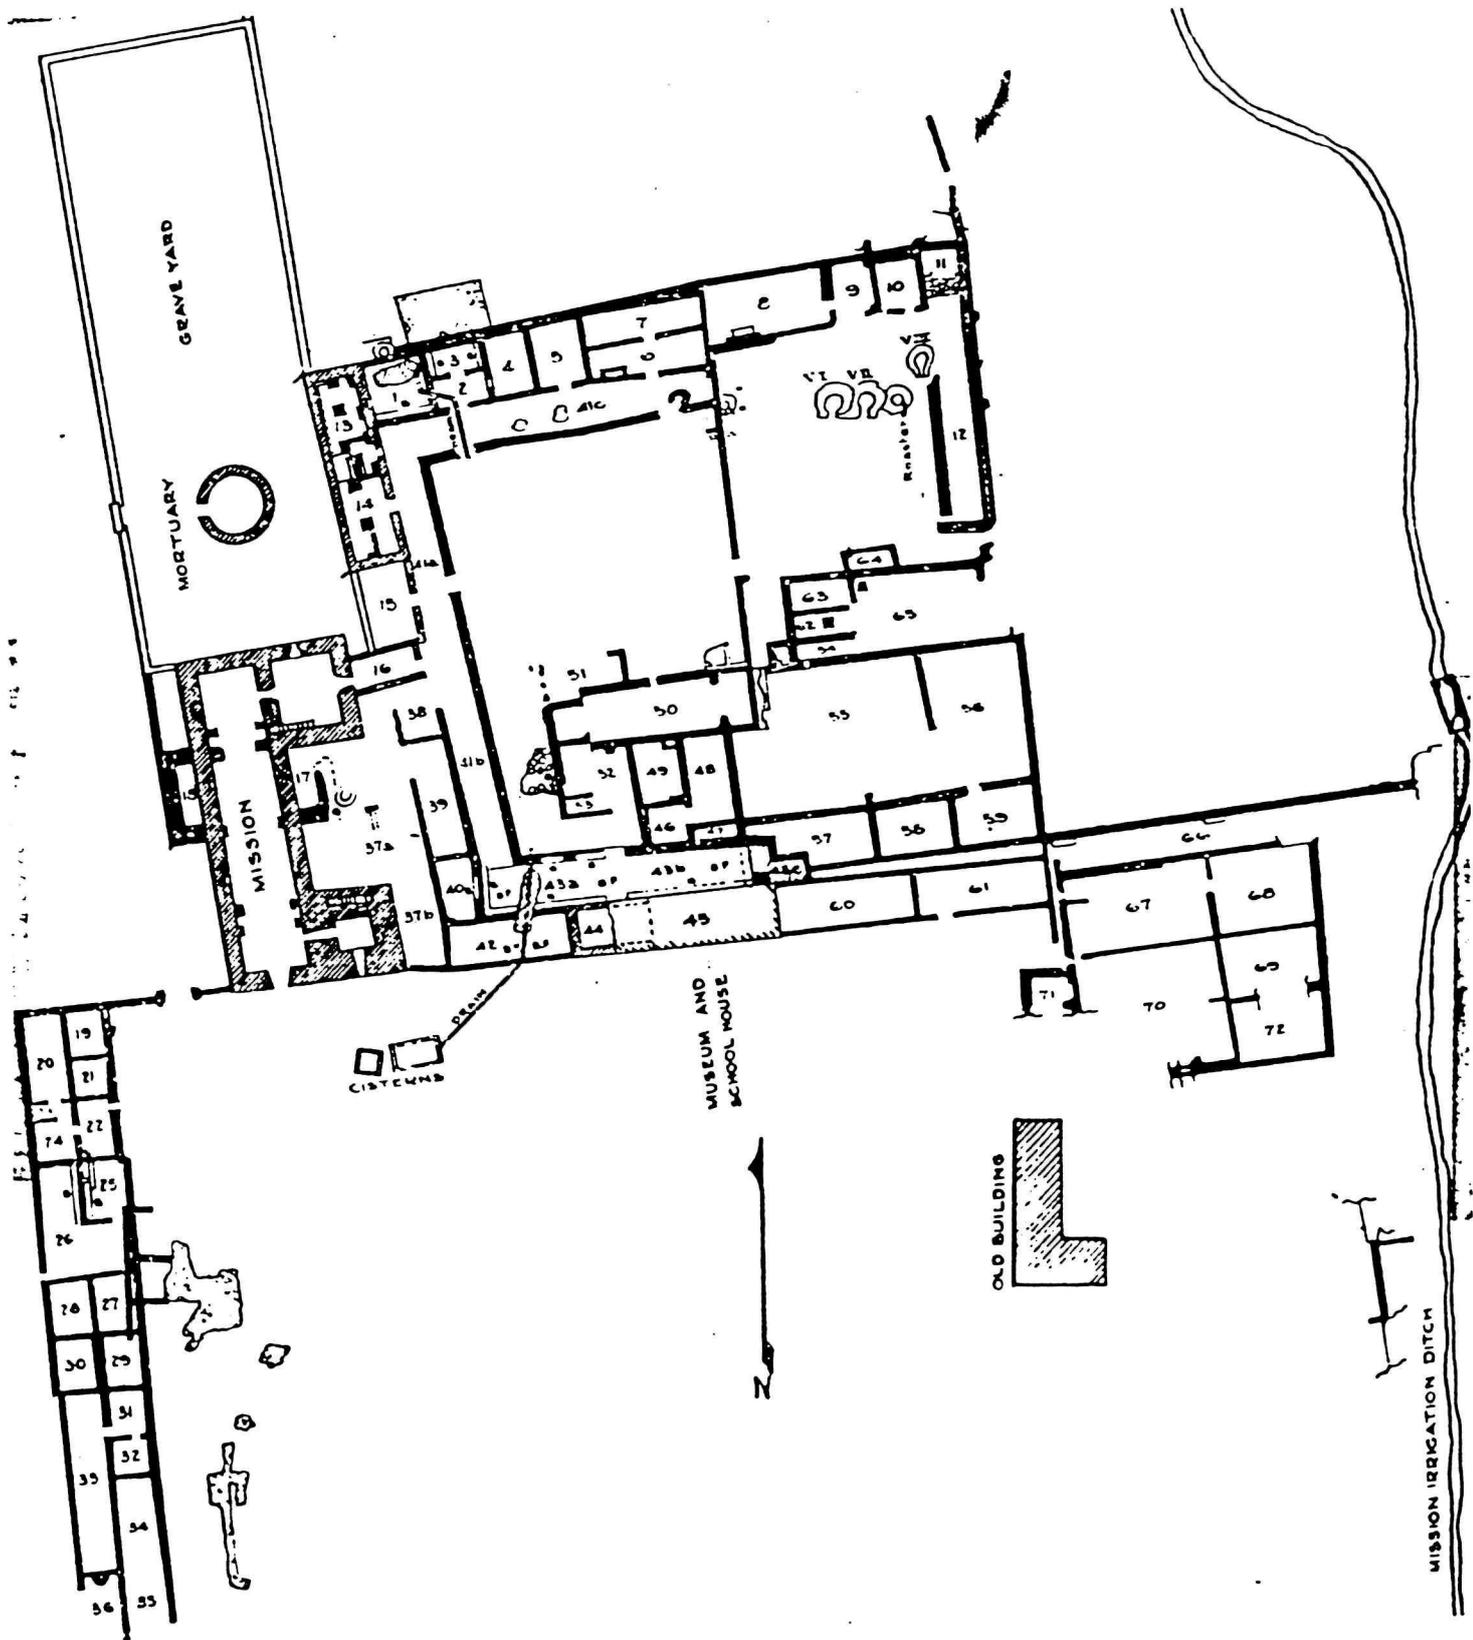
Rooms Outlined in Beaubien's Excavations (1934-1935)
